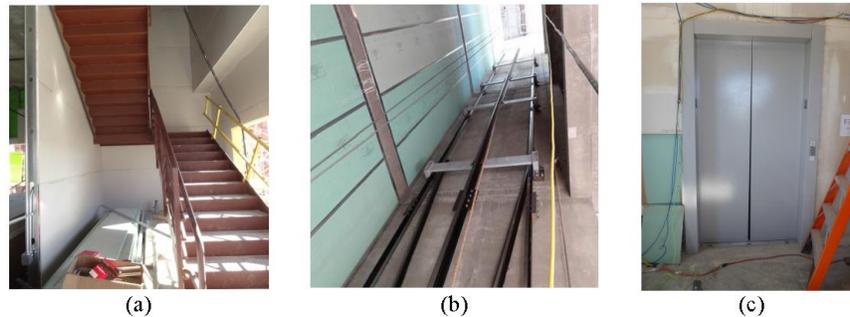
Egress systems (a) stair; (b) elevator guiderails; (c) elevator door. [images 8a and 8b from 8]
